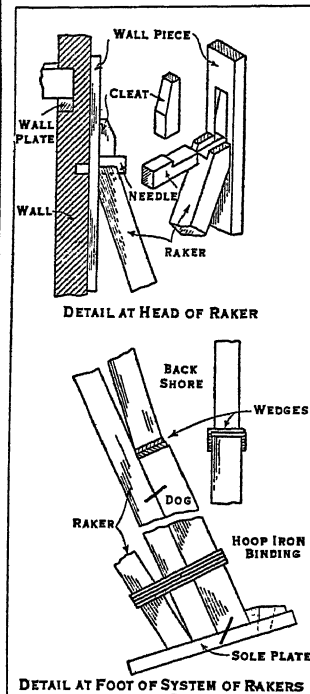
DETAILS OF JOINTS USED IN ASSEMBLING FIG. 1
